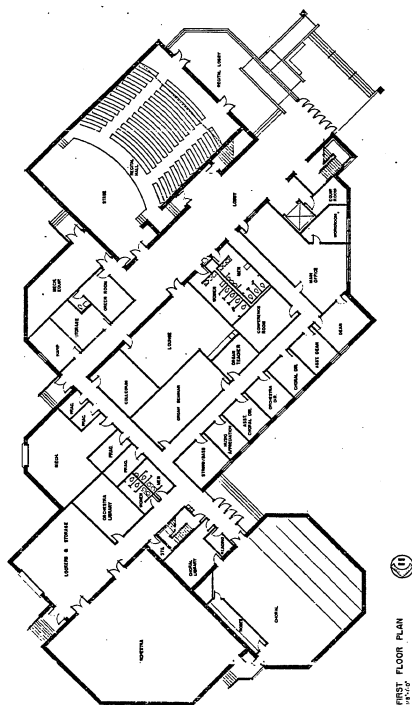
Floor Plans for the New Building for the LSU School of Music
